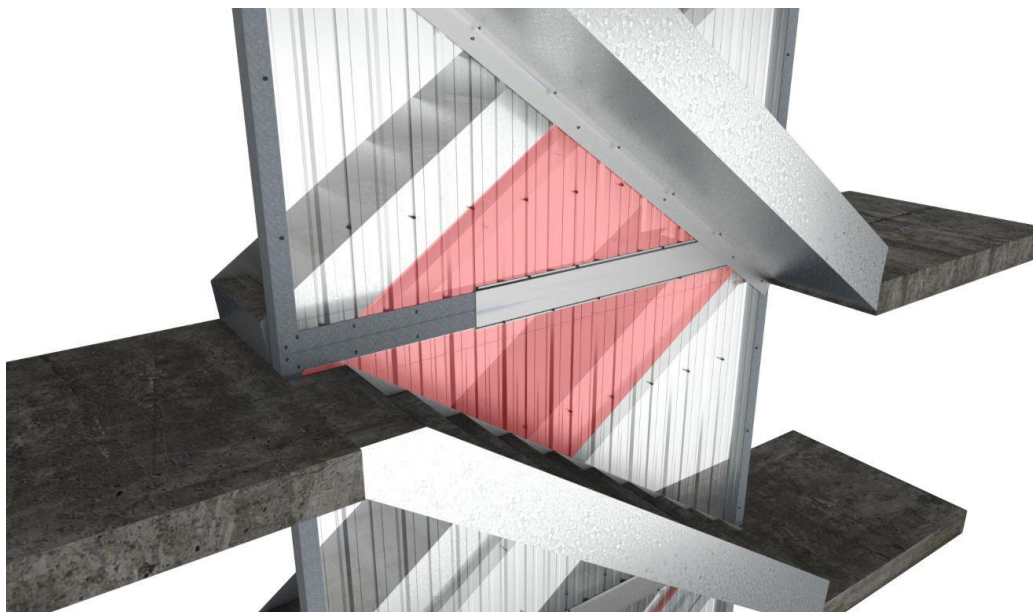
Scissor stair configuration. The part of wall providing fire separation highlighted.
